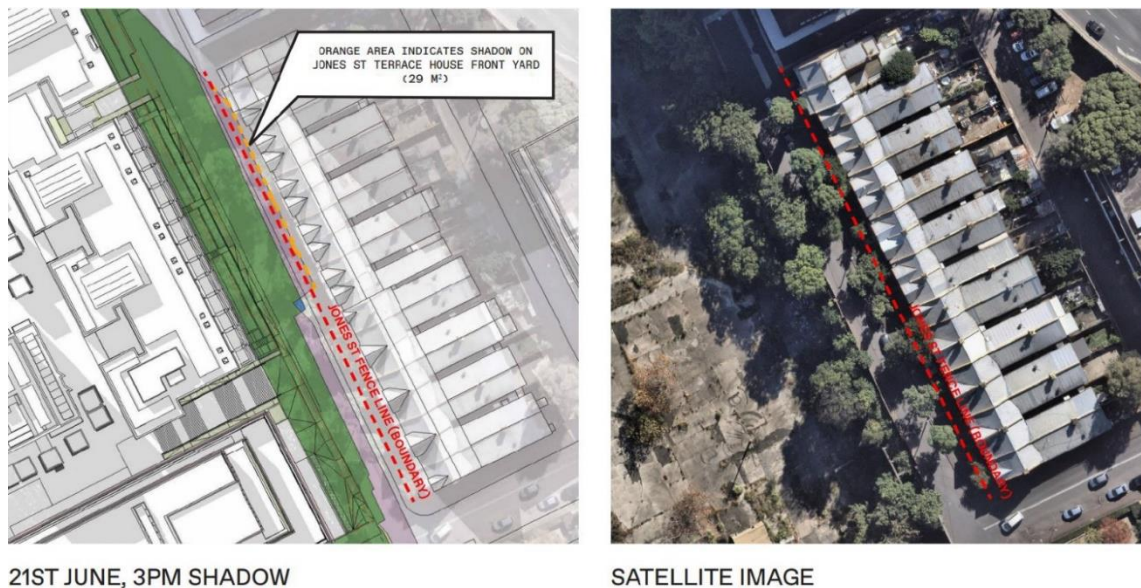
Building B - Jones Street: Shadow diagram at 3pm in midwinter
